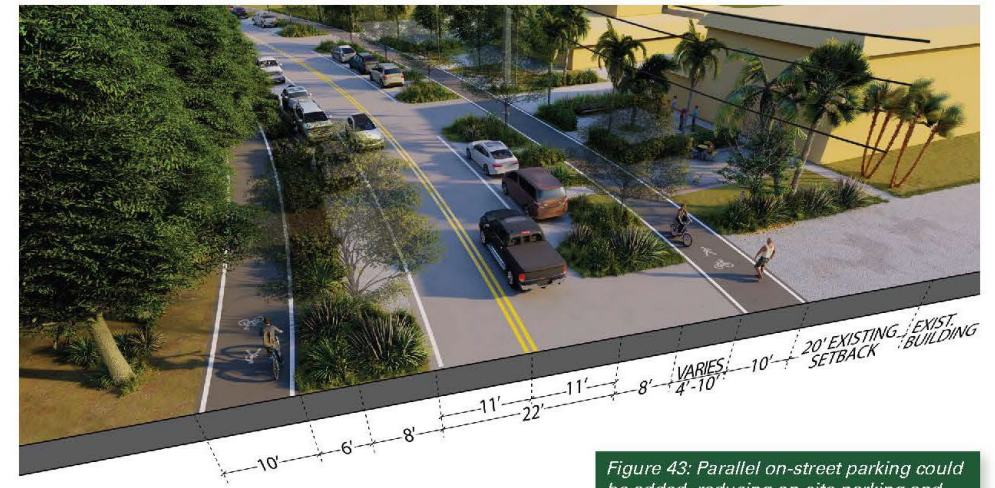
Parallel on-street parking could be added, reducing on-site parking and vehicular crossing of the shared use path.
